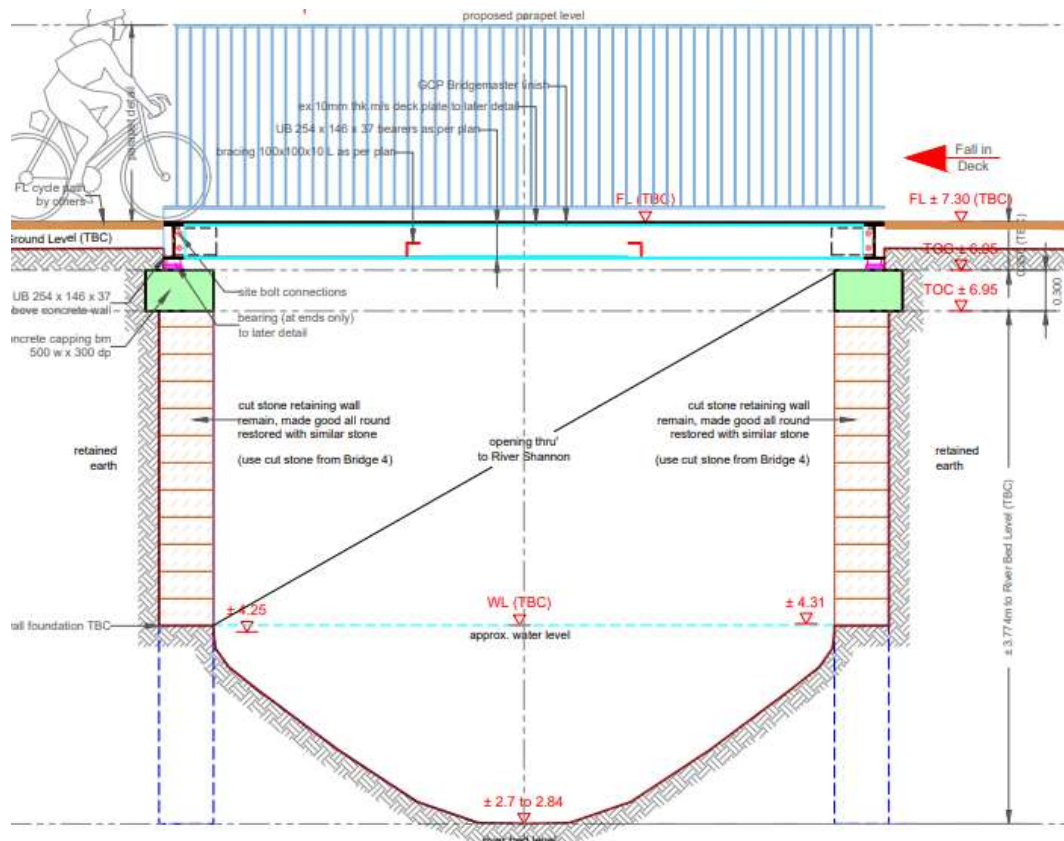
Proposed deck replacement for Bridge 3 with new concrete plinths on existing stone abutments
